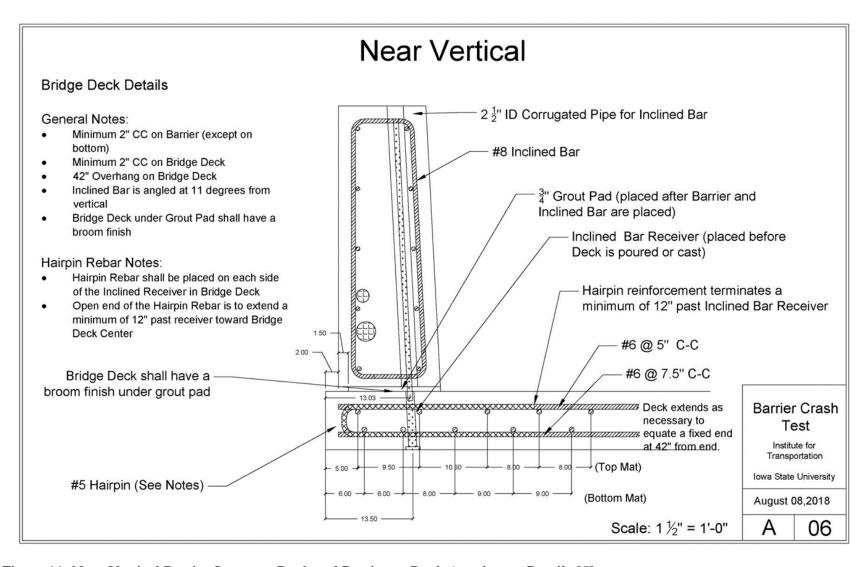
Near-Vertical Barrier Segment, Deck and Barrier-to-Deck Attachment Details [5]
